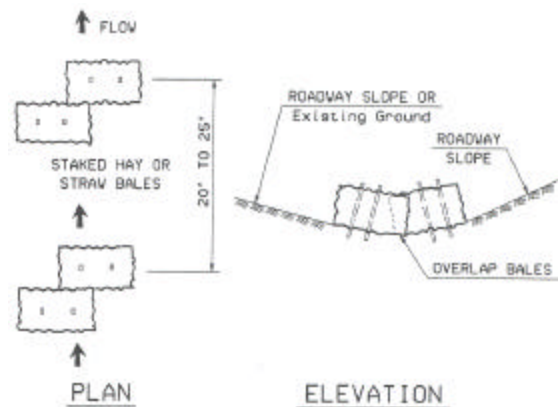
TYPICAL STRAW OR HAY BALE INSTALLATION
